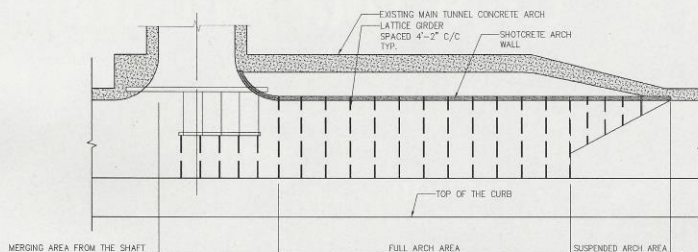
Tunnel ventilation arch wall section—longitudinal section
